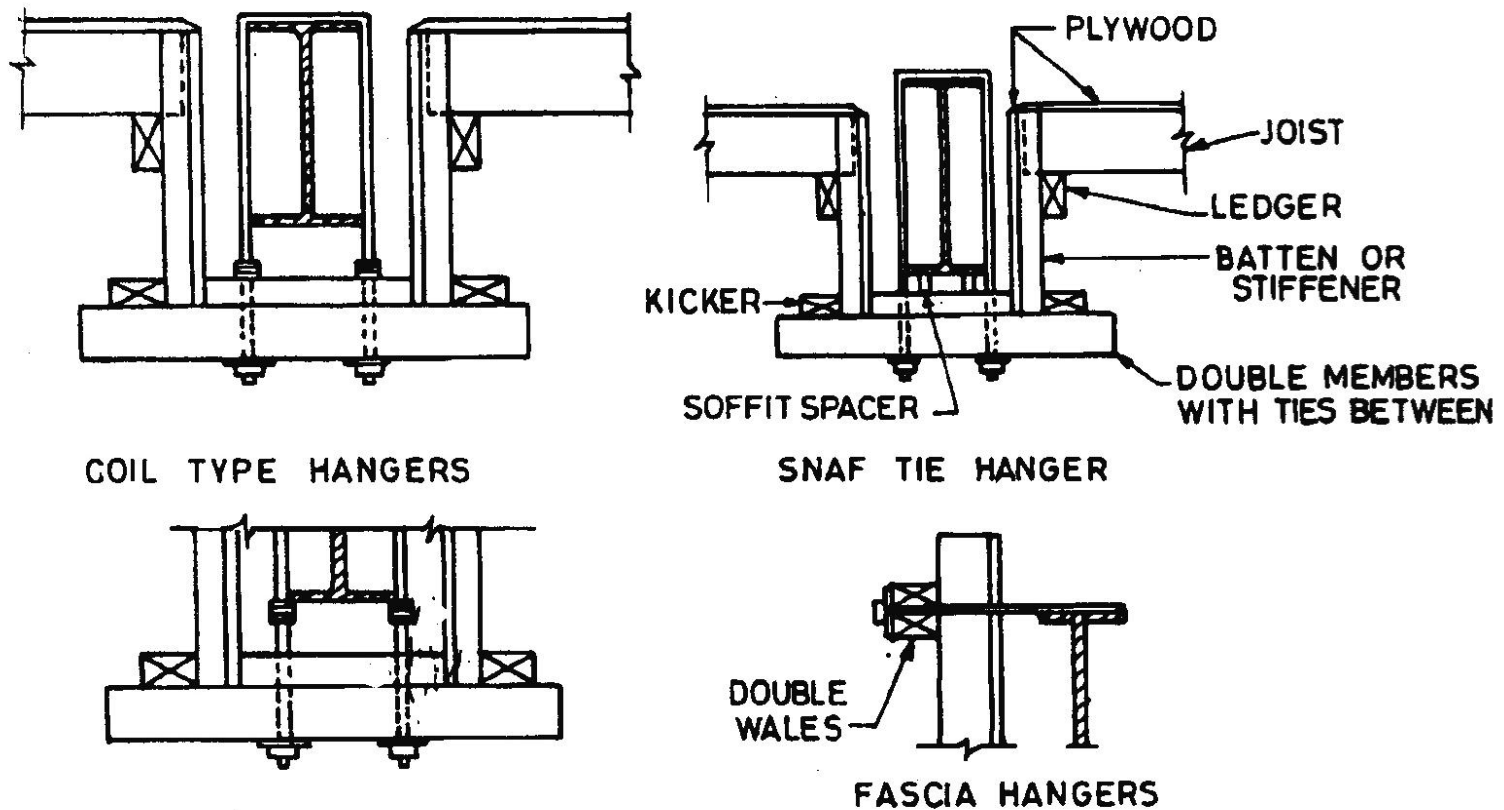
TYPICAL BEAM ENCASEMENT FORMS, SHOWING BOTH COIL AND SNAP TYPE HANGERS
